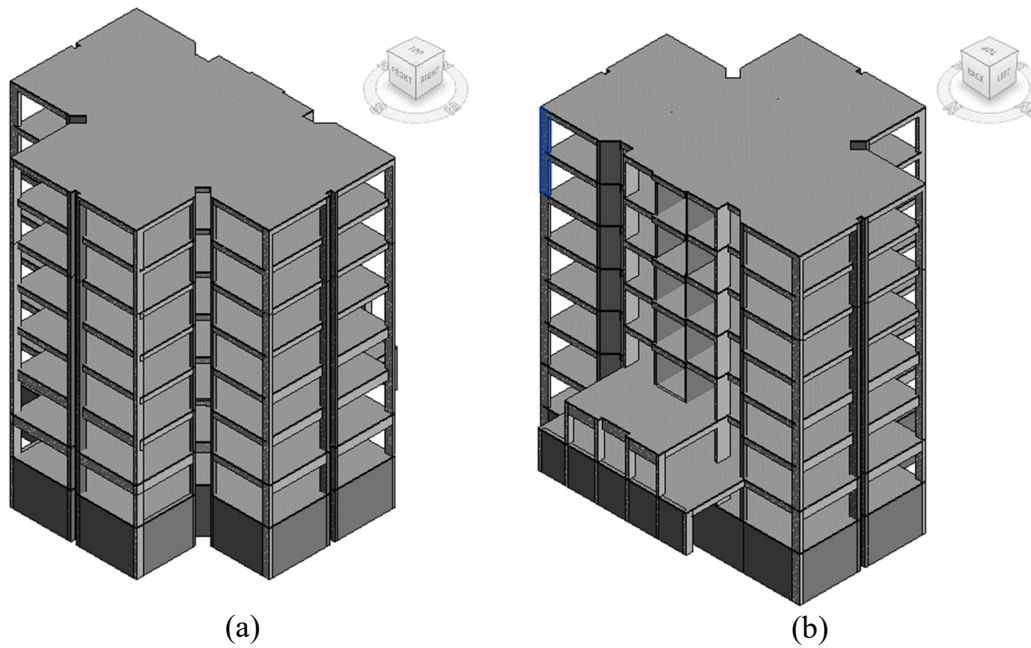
Views of the structural system of the as-built building from the (a) SE and (b) NW corners.
